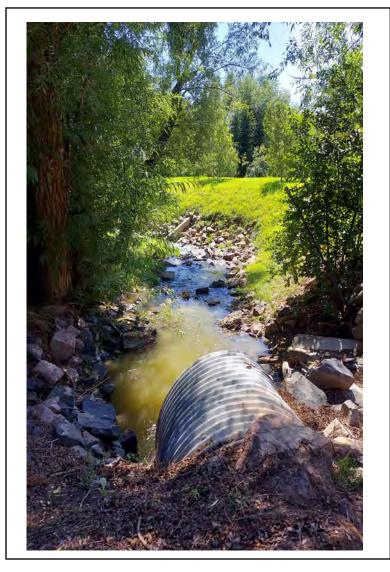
View of driveway culvert crossing of Raccoon Creek looking southeast and offsite
